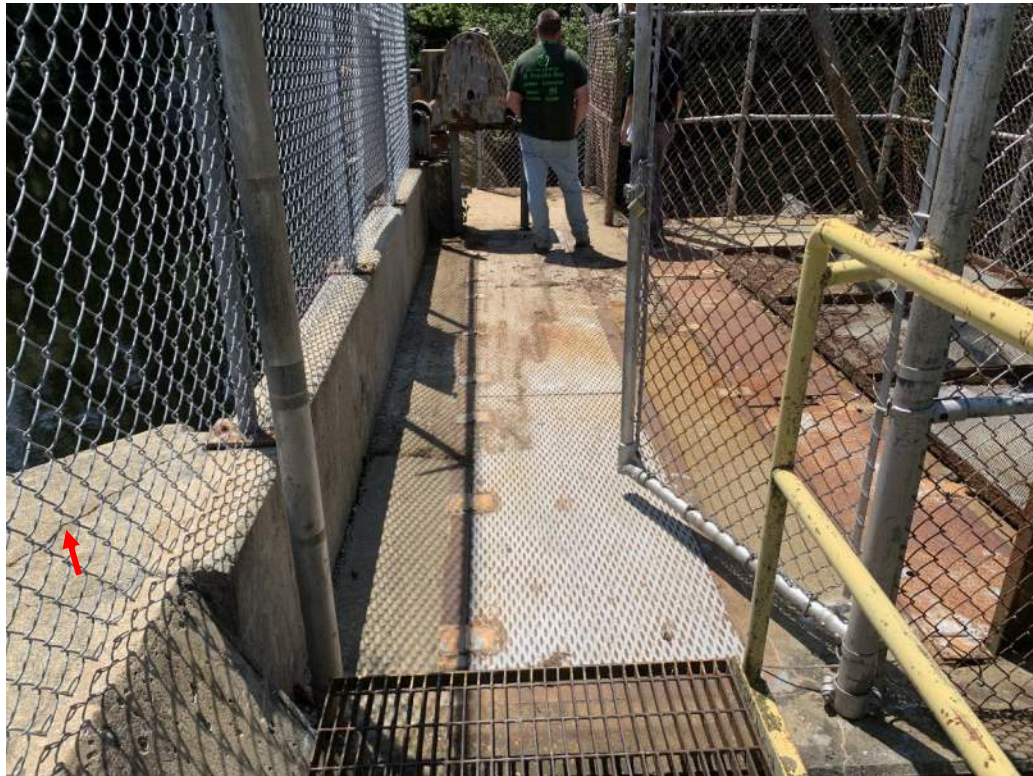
View of operator platform/top of intake structure from access walkway, looking left. Note cracking.
